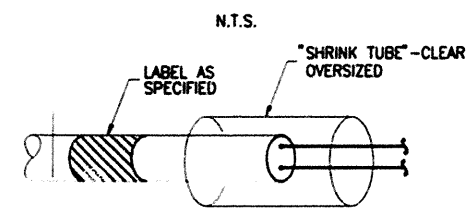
# DETAIL "B" - TYPICAL CABLE LABELING METHOD
